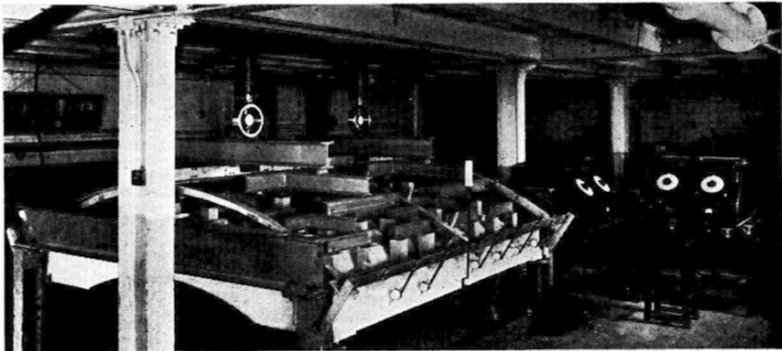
TEST RIG SHOWING DISTRIBUTION OF LOAD FROM TWO JACKS THROUGH A SYSTEM OF STEEL JOISTS
